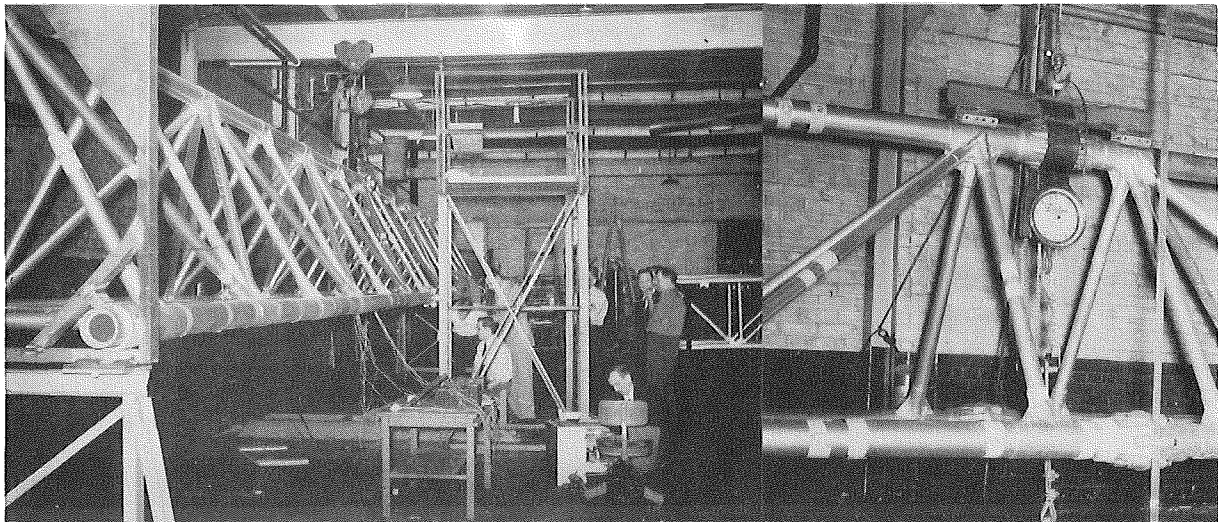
60-ft. plastic fiberglass truss loaded at center span in the horizontal plane position (left). View at right shows dynamometer and loading arrangement.
